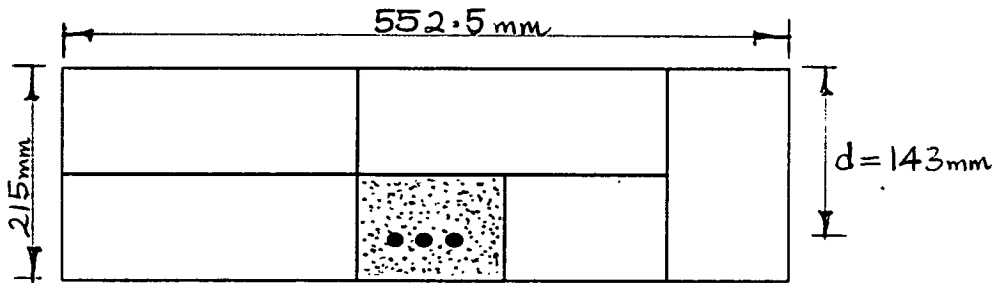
Cross-section of the pocket-type reinforced brickwork beam (B5-B8)
